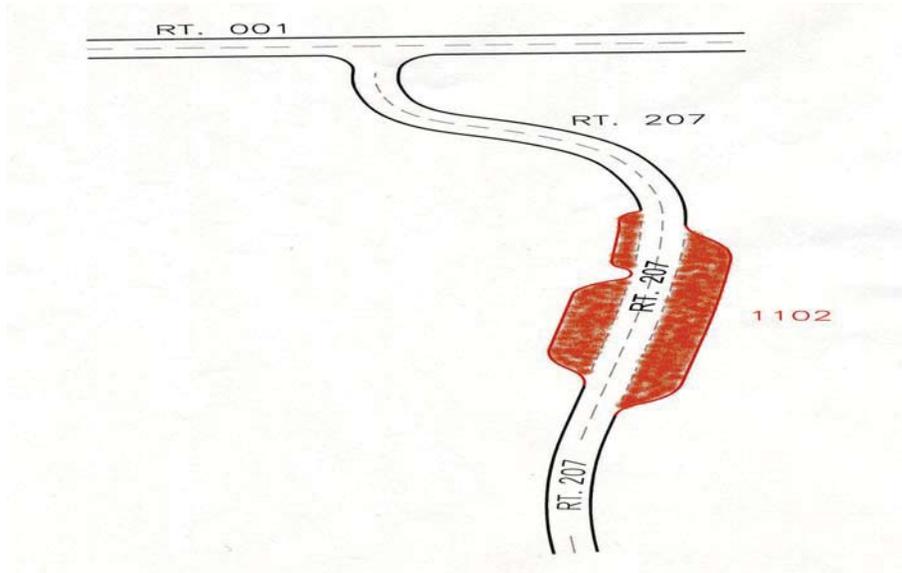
Parking with access route 207 running through and continuing beyond parking 1102. This access route cannot be considered a part of the parking area and two routes and two assets continue to exist.
